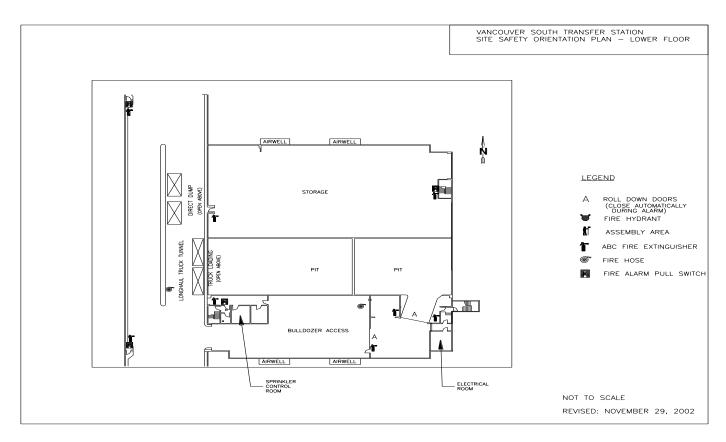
Vancouver South Transfer Station, Lower Floor, Plan View
